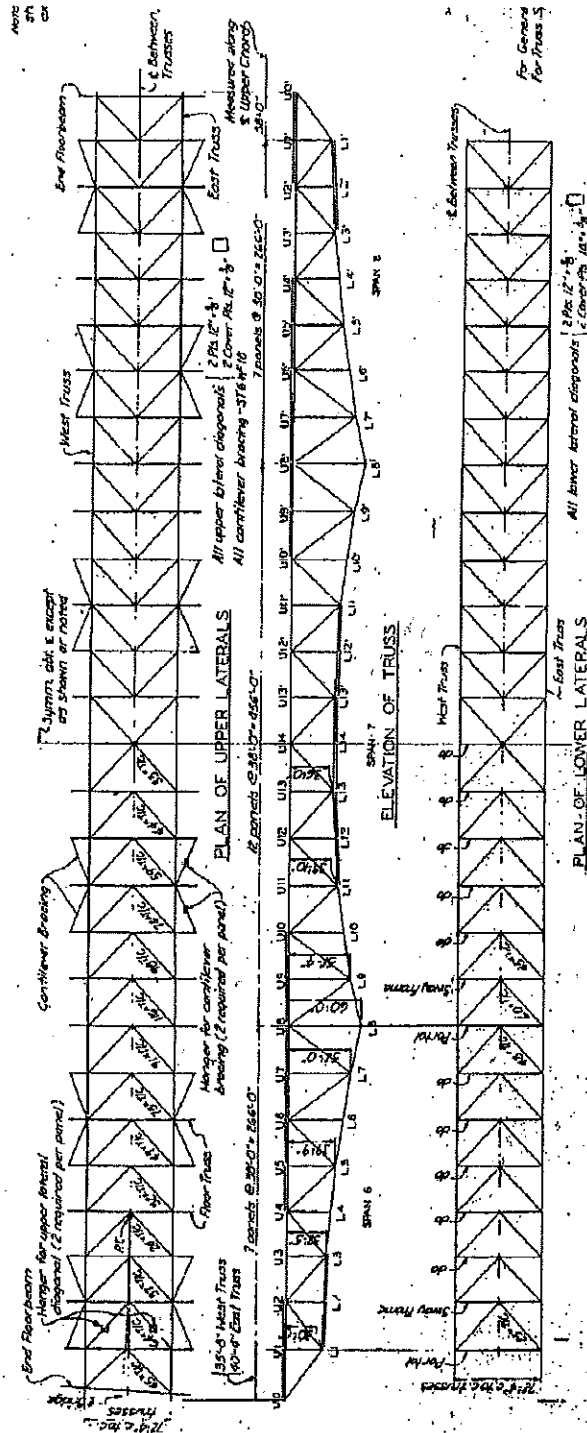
Deck Truss Framing Plan and Elevation from Original Contract Plans
